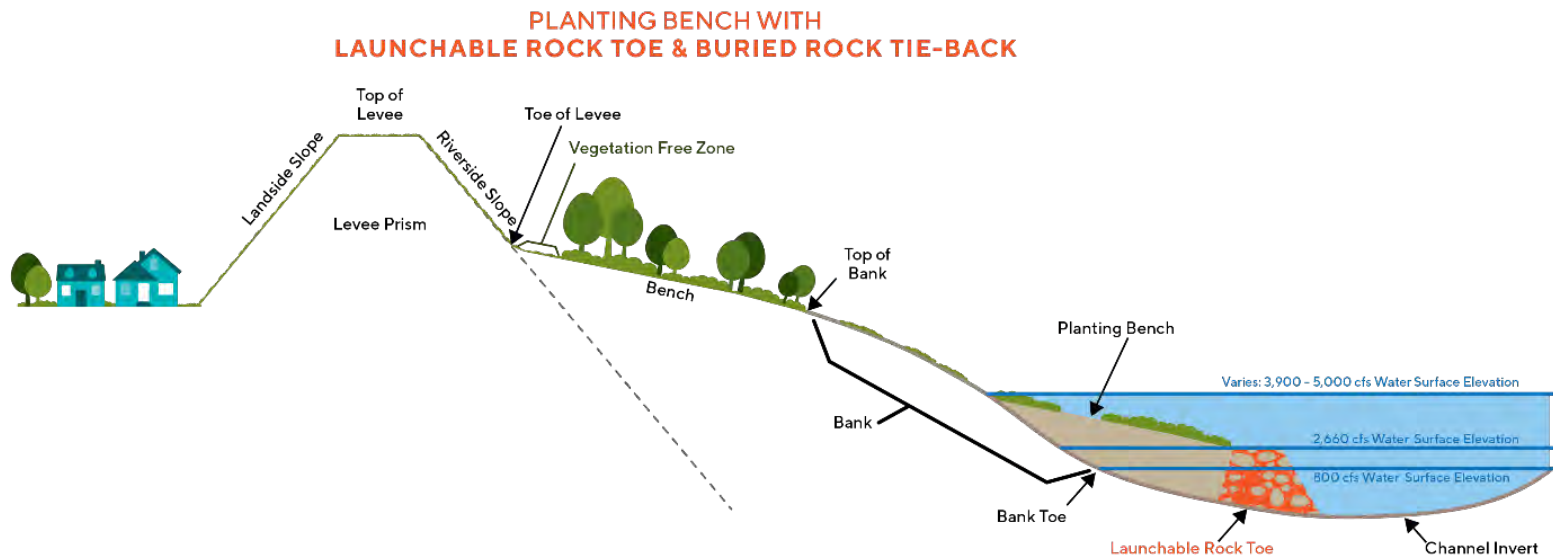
Planting Bench with Launchable Rock Toe and Buried Rock Tie-Back
